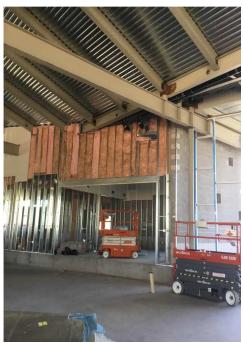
Homework Help Center wall insulation and roof drain routing
